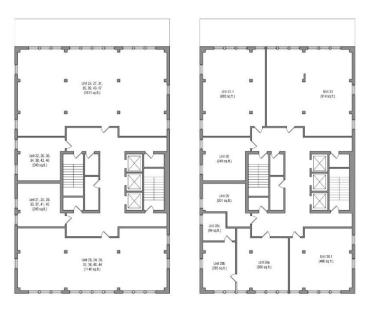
, 307 (left to right): Building 10, eighth floor (1921); same floor (1979). 1" = 32'. North is up.
